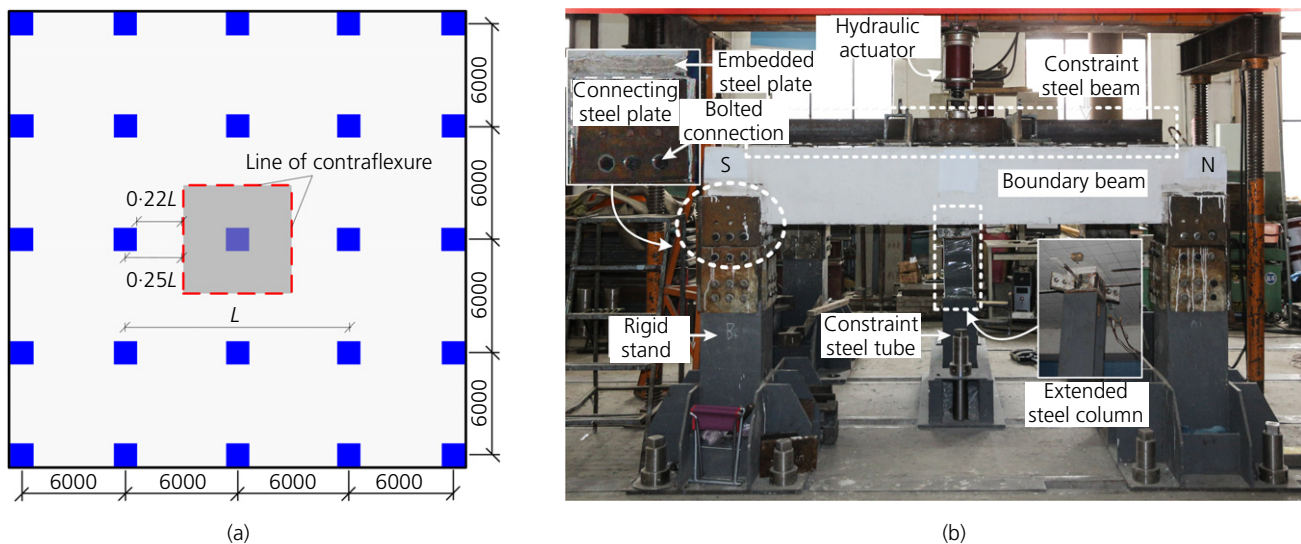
Prototype structure and test setup: (a) plan view of prototype structure (dimensions in mm); (b) test setup
